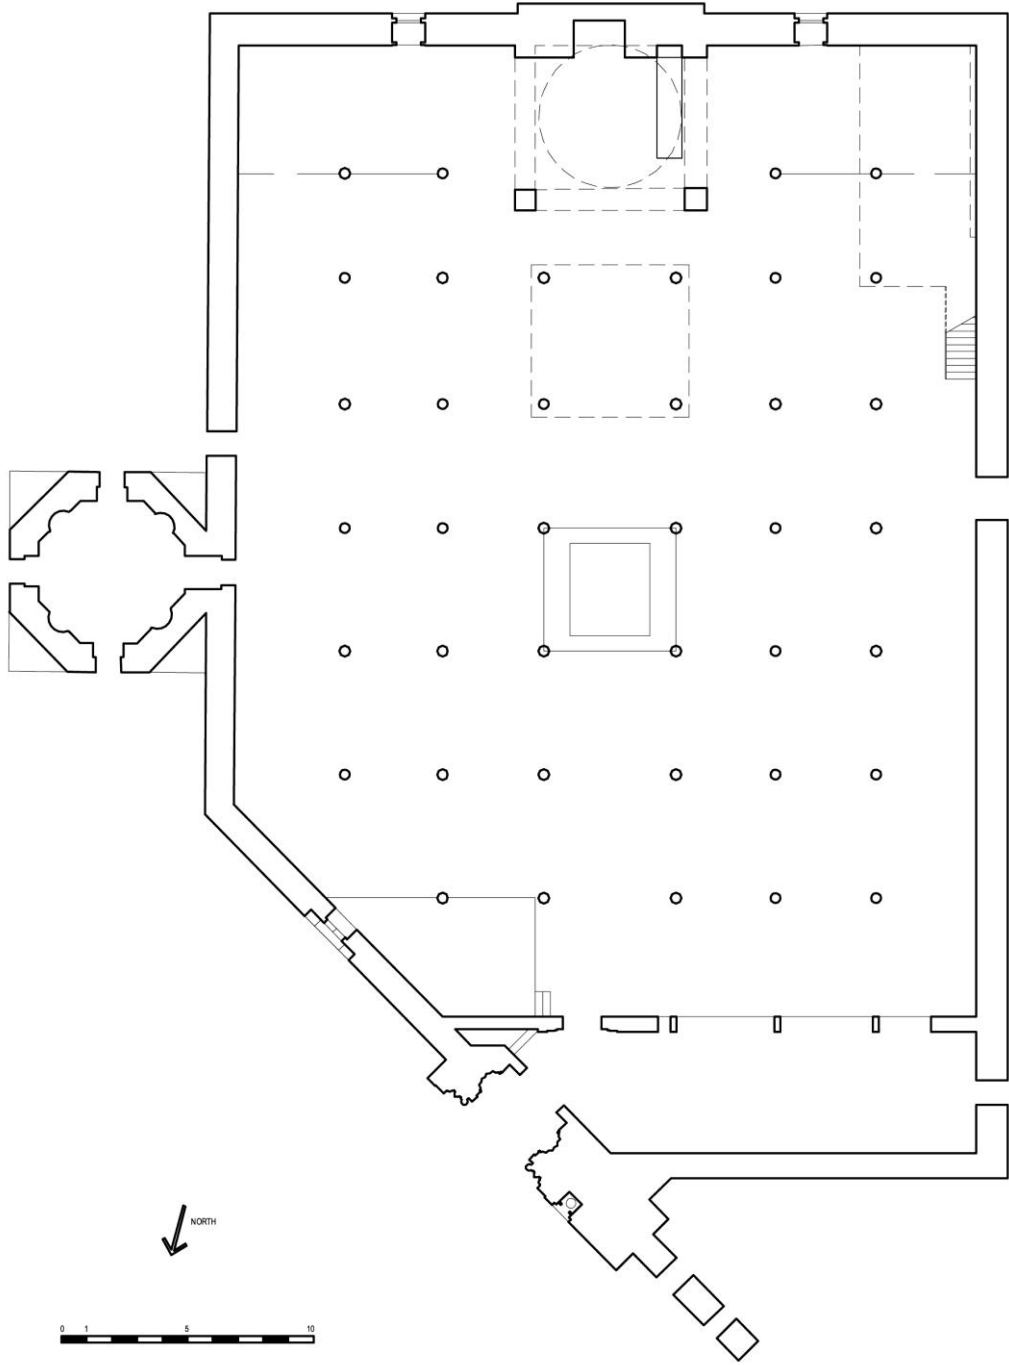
Eşrefoğlu Cami, Beyşehir, Plan. (drawing by the author from site measurement)
